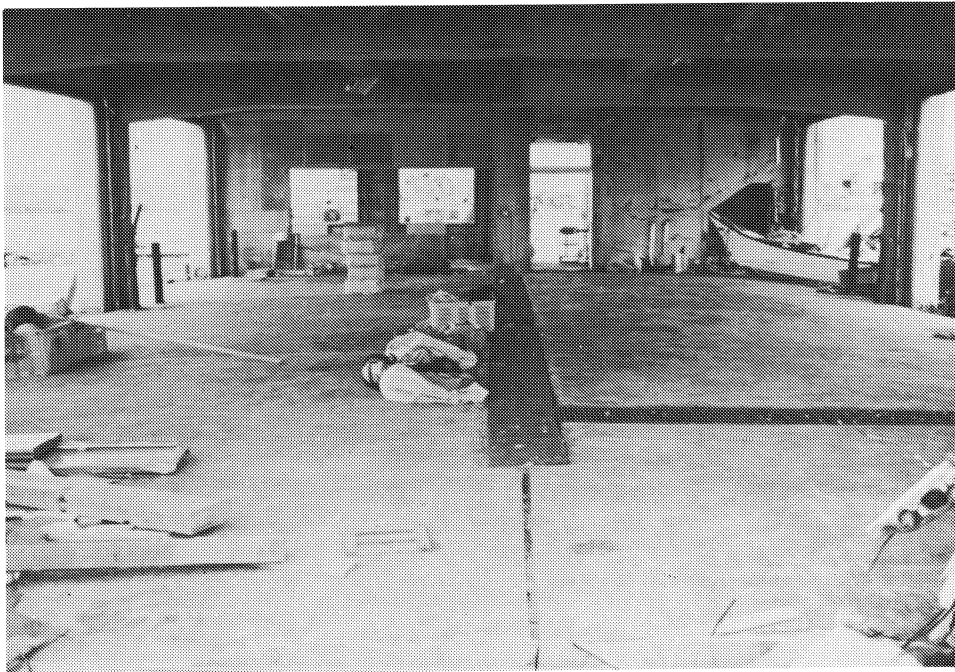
A two-story concrete-frame building survived the earthquake and tsunami with light structural damage. It is located at the front of the harbor. The ground floor finishes were completely destroyed. The damage to the left concrete wall is probably from tsunami-borne debris such as the overturned forklift in the center. The ground-floor concrete slab of the building was severely distorted from settlement, probably induced by the shaking--not by the tsunami. The structure appears to be repairable.
